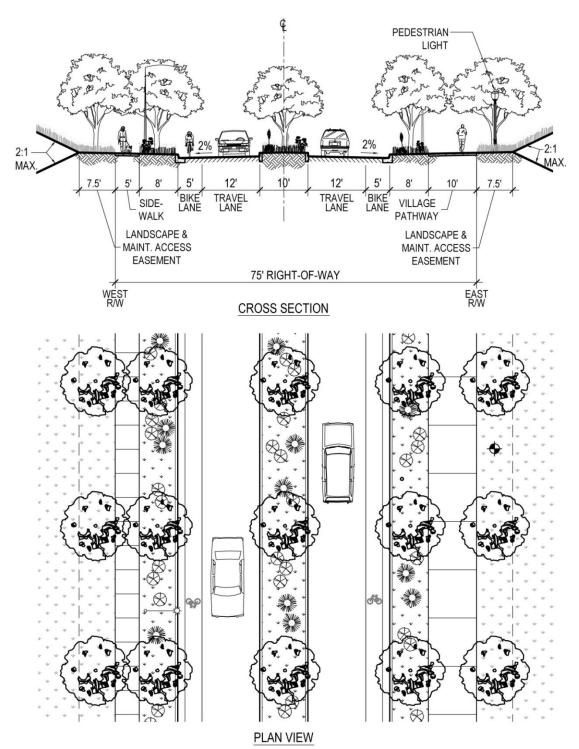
Modified 2-Lane Secondary Village Entry (Portion of Santa Picacho)
